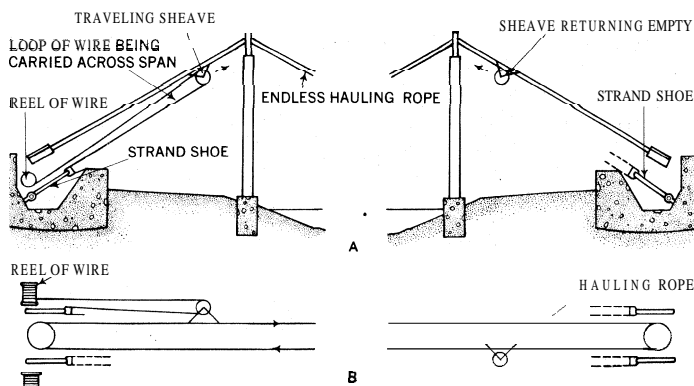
DIAGRAM ILLUSTRATING METHOD OF SPINNING PARALLEL WIRE CABLES ON A SUSPENSION BRIDGE: (A) ELEVATION; (B) PLAN
